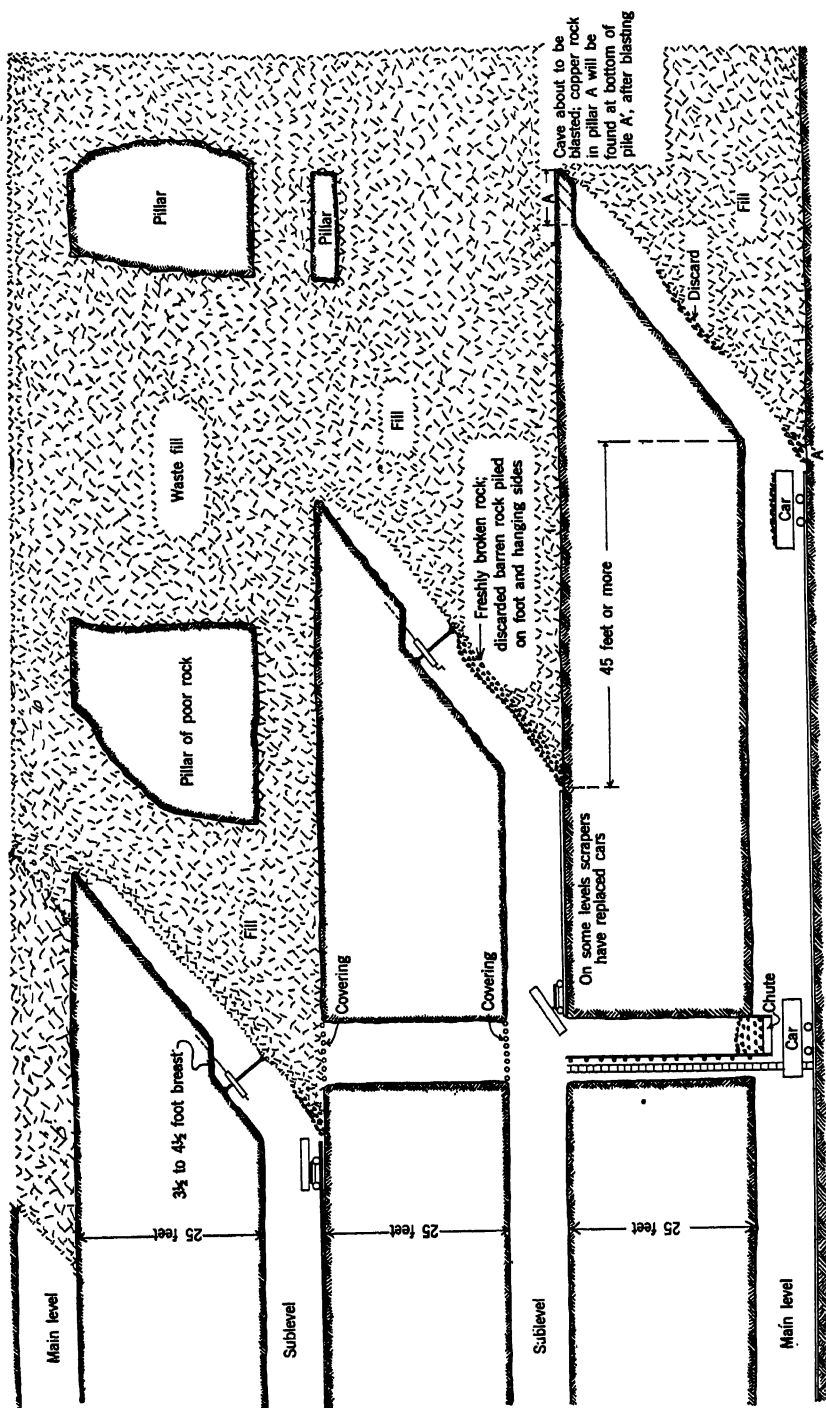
NEW STOPING METHOD, SUBLEVEL INCLINED CUT AND FILL, USING CARS.
